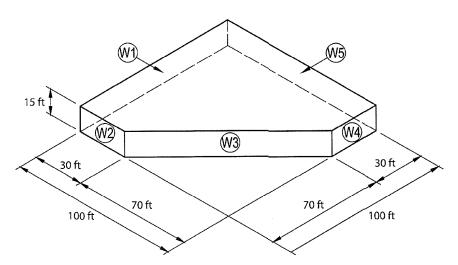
100-ft × 100-ft Unusually Shaped Building
